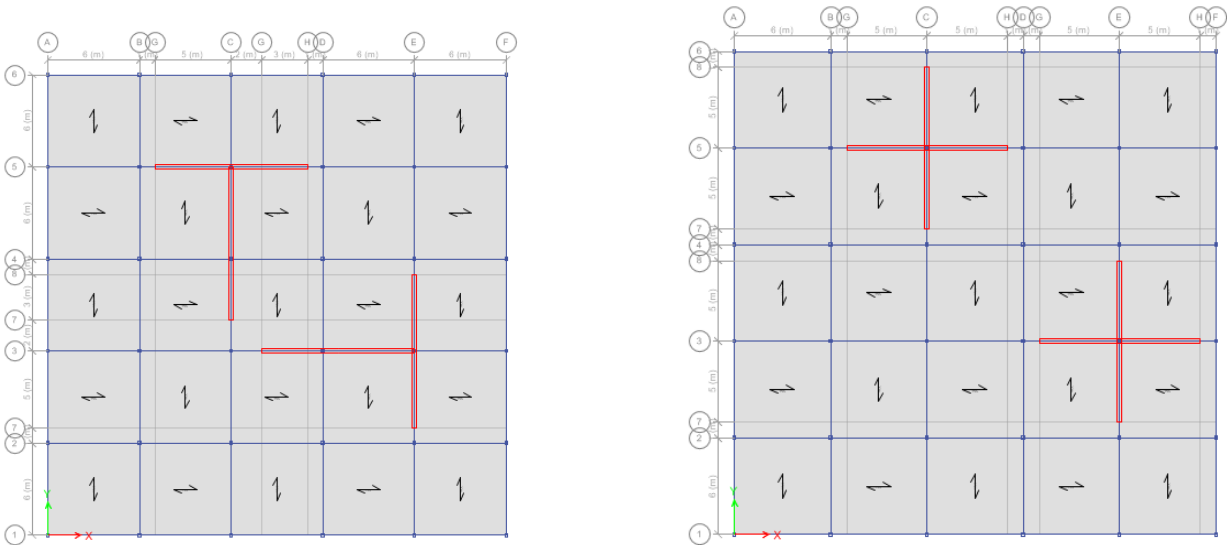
illustrates the layout of T-shaped and + -shaped shear walls in the floor plans of the 10-, 20-, and 30-story buildings. For the 10-story building, the thickness of the shear wall in all floors is 30 cm. In the 20-story building, the thickness of the shear wall is 40 cm for the lower 10 floors and 30 cm for the upper 10 floors. In the 30-story building, the thickness of the shear wall is 50 cm for the lower 10 floors, 40 cm for the middle 10 floors, and 30 cm for the upper 10 floors.
